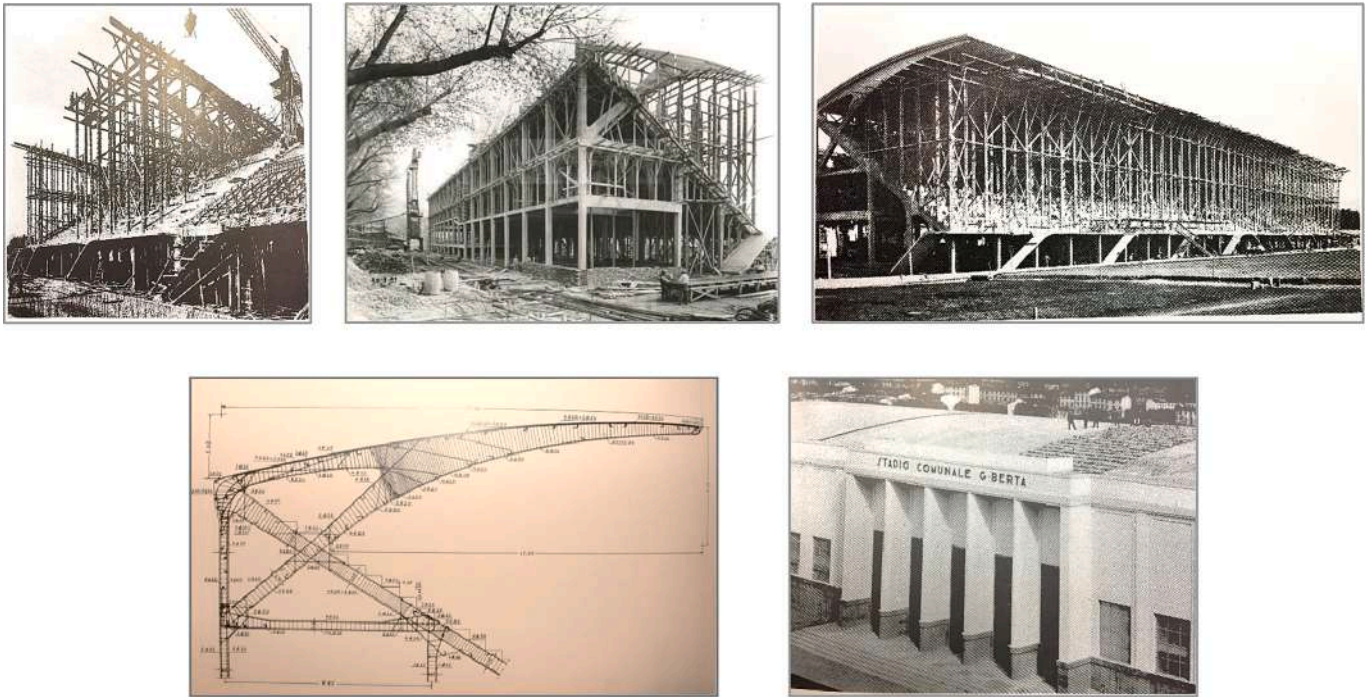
Views of the scaffolding system of the cantilevered roof of Tribuna Centrale stand, original design drawing of its structural section and the upper portion of the supporting sloped frames, and loading configuration adopted for the final tests on roof portions (photographic archives Barsotti, Florence – top images, and of the Municipality of Florence – bottom images).
